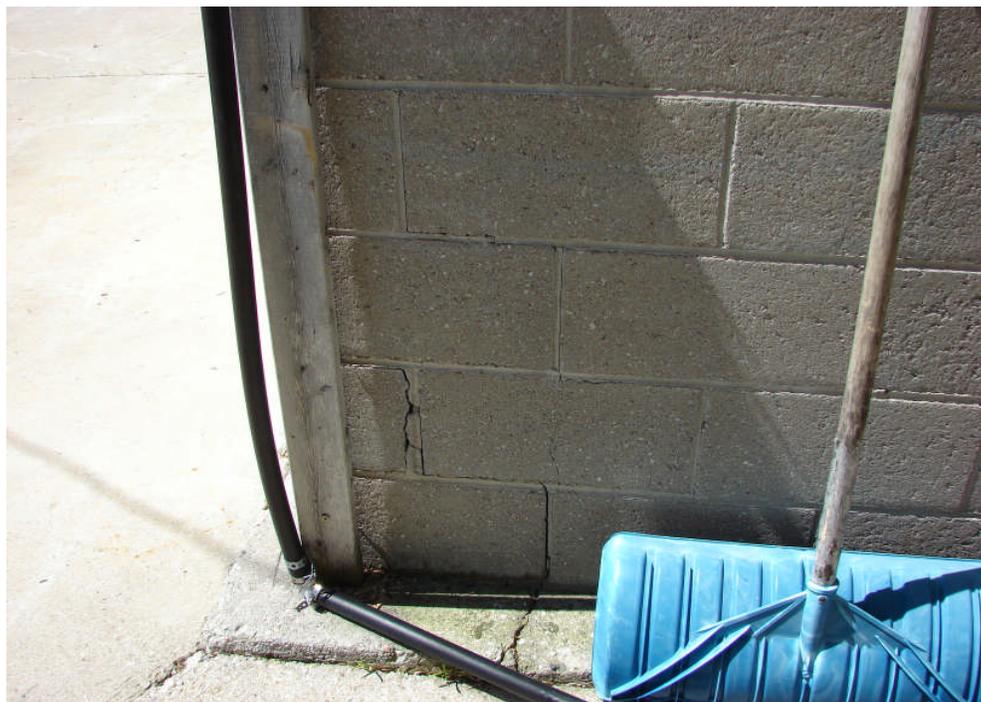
Garage Building east elevation (south part) – severely deteriorated and breaking concrete door threshold, typical.
